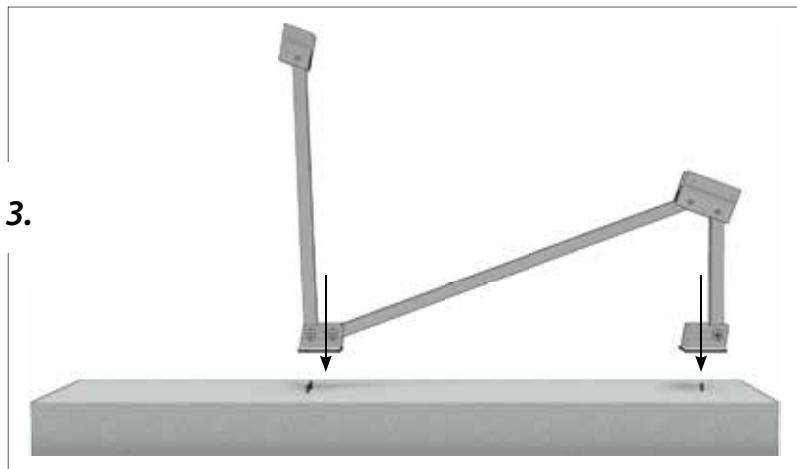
3 (positioning and fastening the strut assembly)
